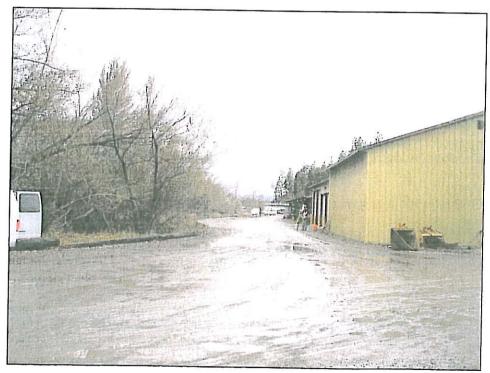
View west, showing riparian habitat along creek at left and proposed storage building location on extreme right at end of existing building.
